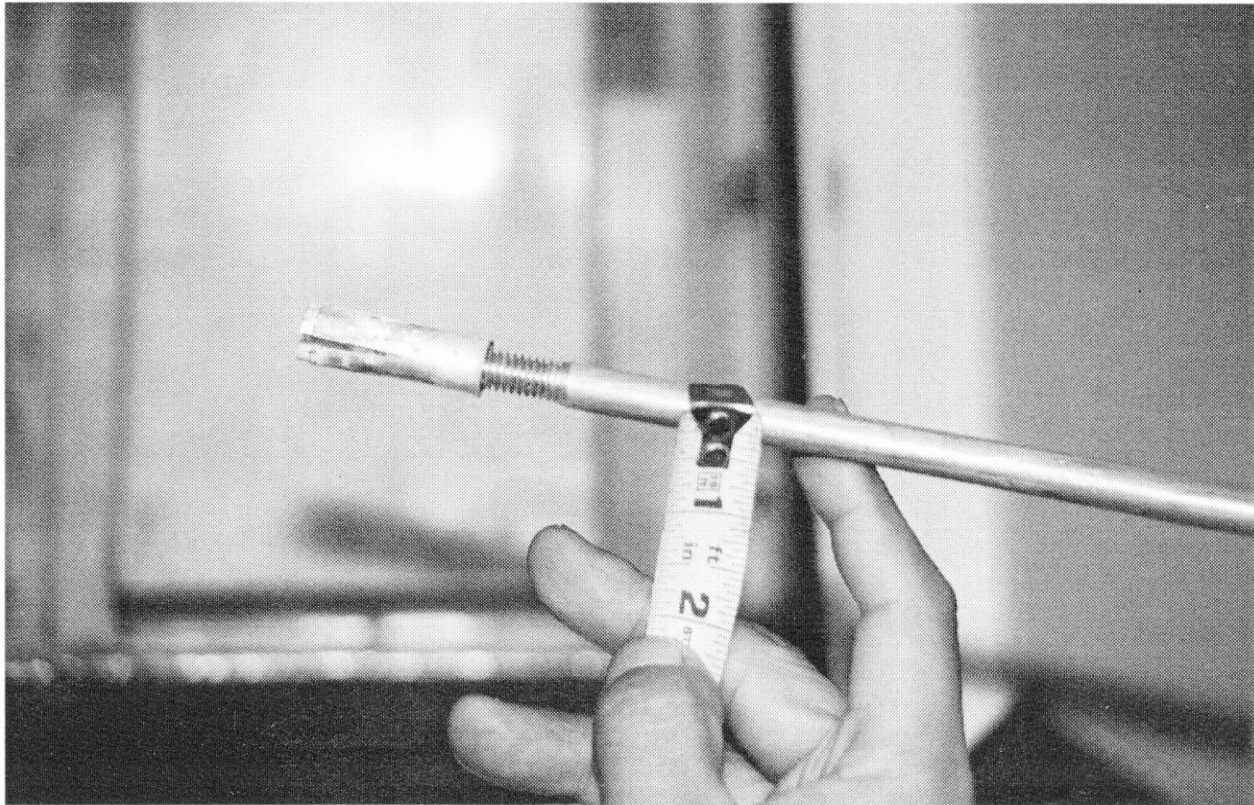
Shown is a close-up of the expansion anchor which pulled out of the reinforced concrete ceiling. It appears that there was inadequate expansion of the shell. (Reference 34)
